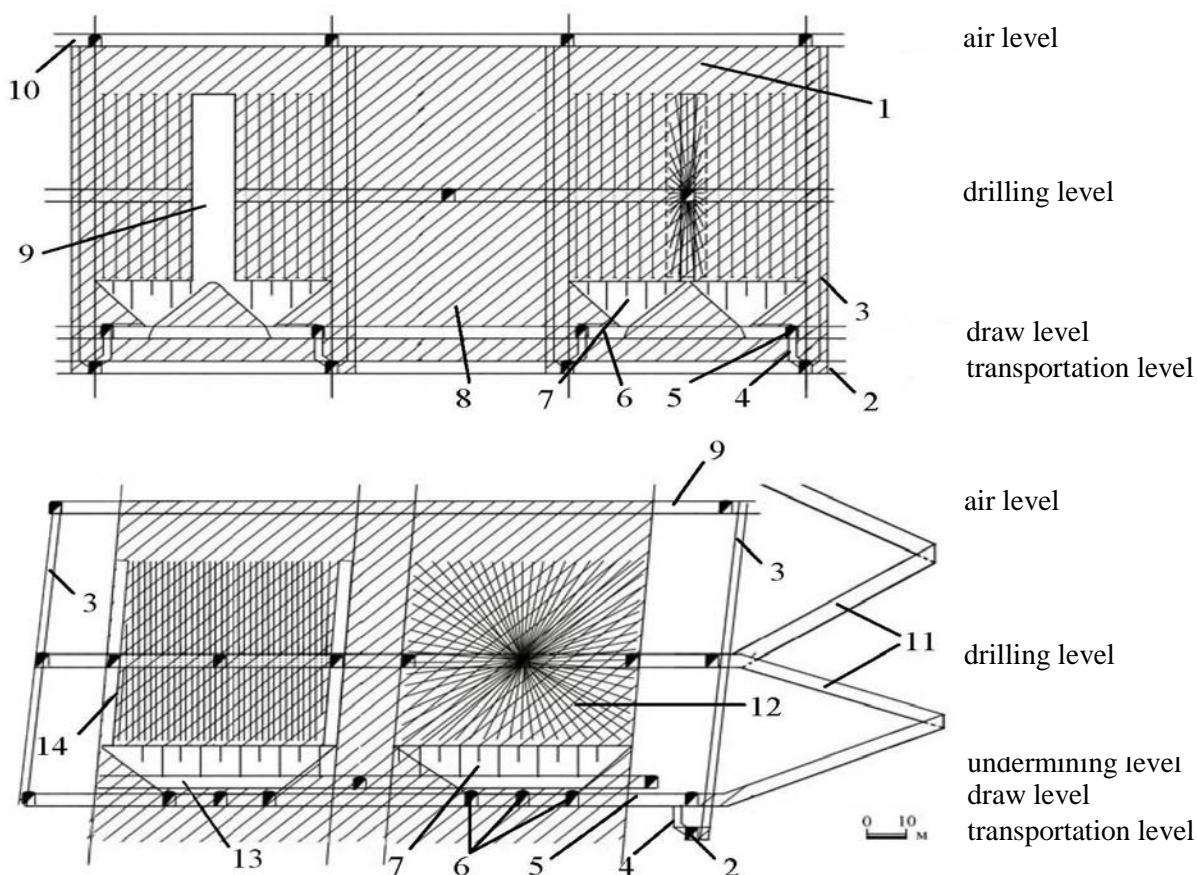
Level room development with dirt inclusions leaving in the section: 1 – primary stope (room); 2 –hauling roadway; 3, 4 – ventilation and manway raise , ore-pass; 5, 10 – draw entry; 6 – loading rooms; 7 – ditch undercutting; 8 – stope of the second turn (room fender); 9 –vertical compensation room; 11 spiral ramp; 12 rings of block caving deep holes; 13 –cutoff ditch ort; 14 – cut raise.
